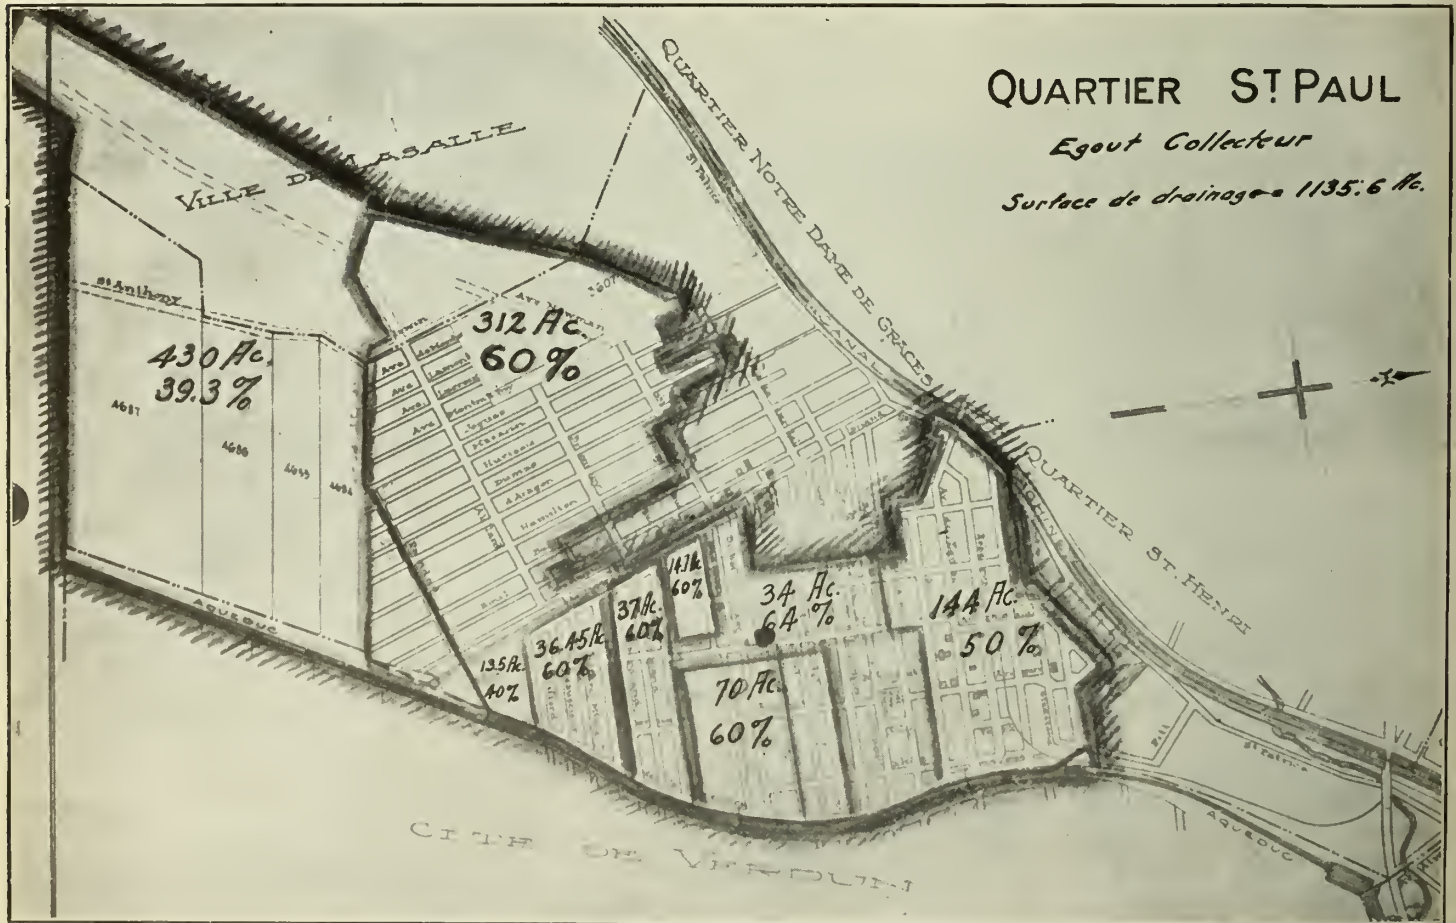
General Plan of St. Paul Ward Drainage District.
